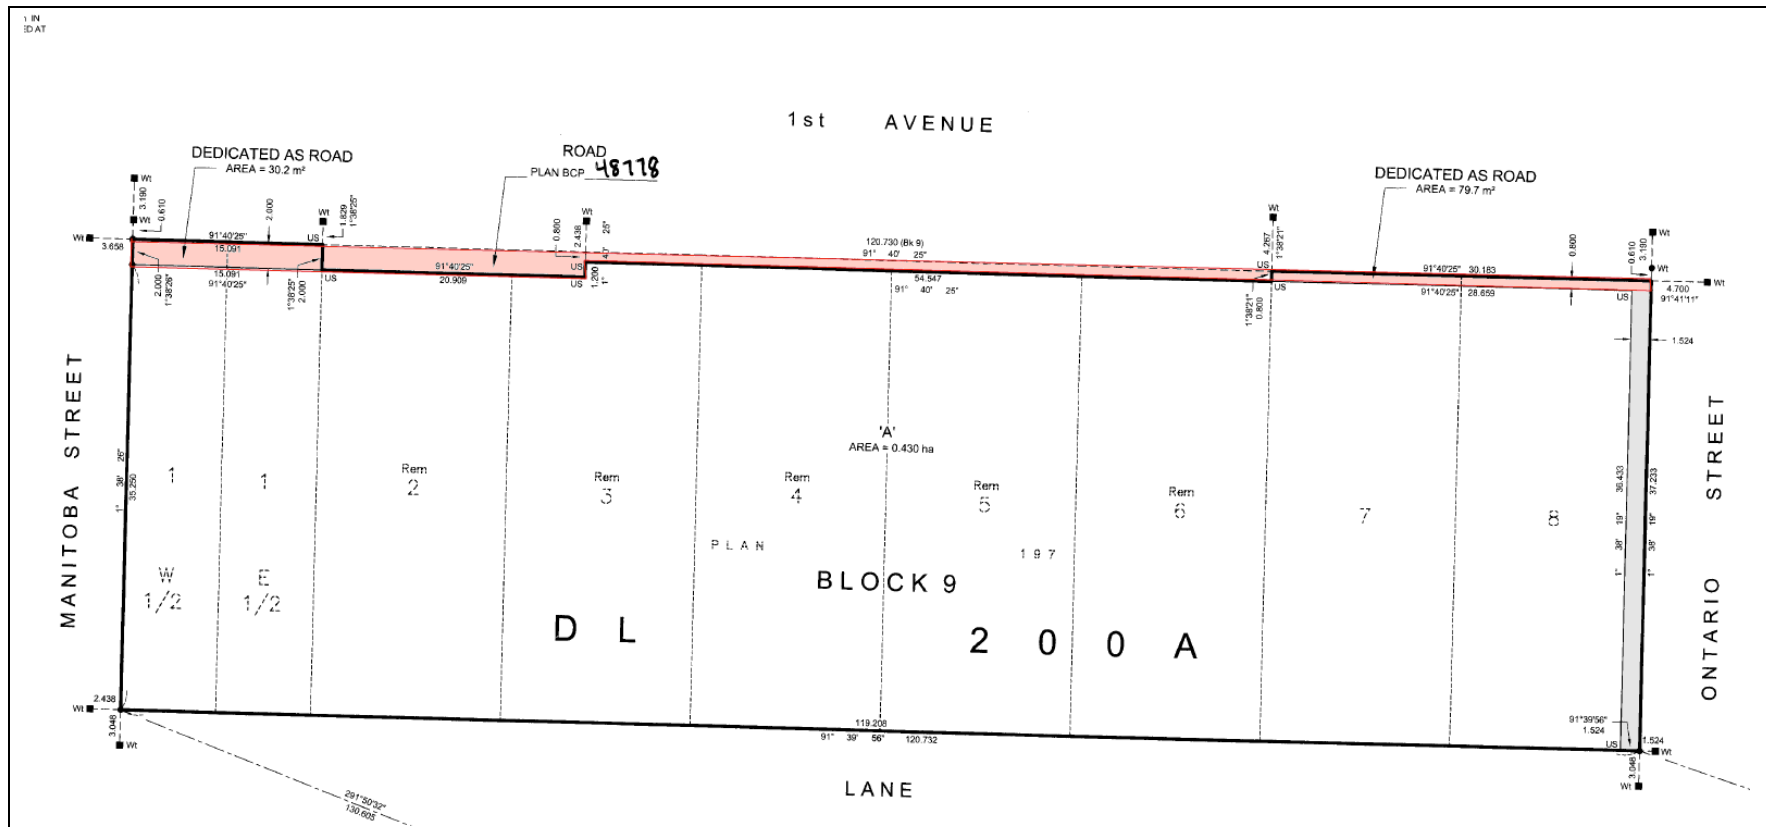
Site Plan and Risk Control Requirements for Road Dedication
